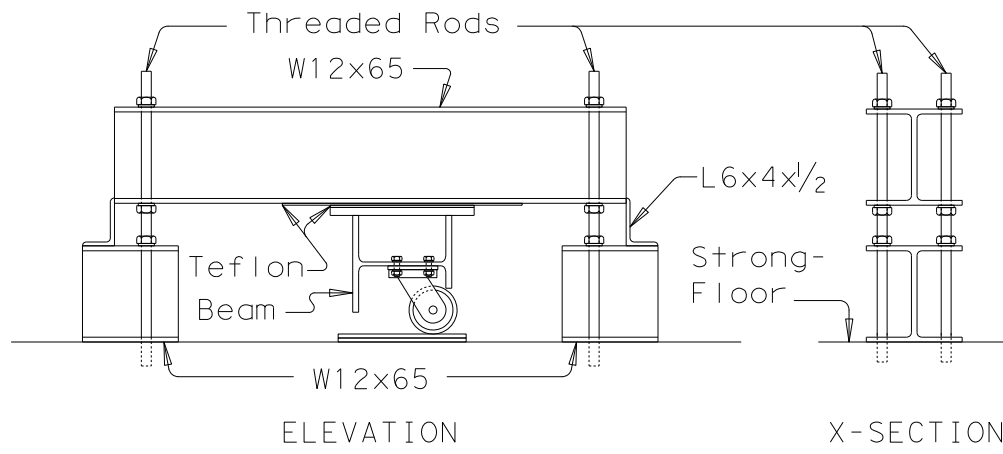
Elevation of Hold-Down Beams and Cross-Section at Connection to Floor
